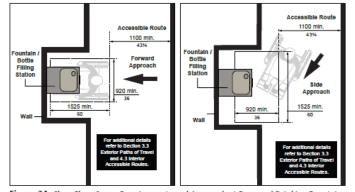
Clear Floor Space Requirements and Approach at Recessed Drinking Fountain / Bottle Filling Station - Plan View
